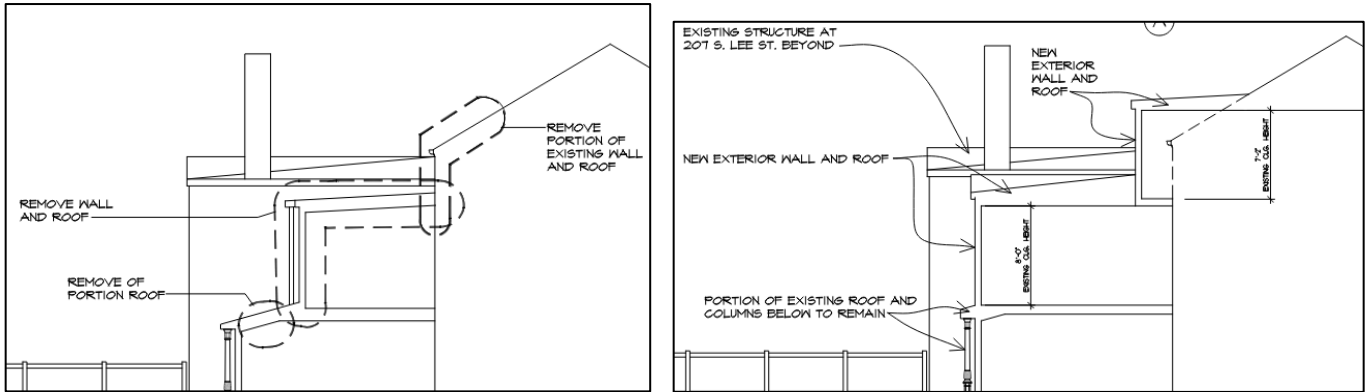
Proposed demolition work (left) and new construction (right) on west elevation
